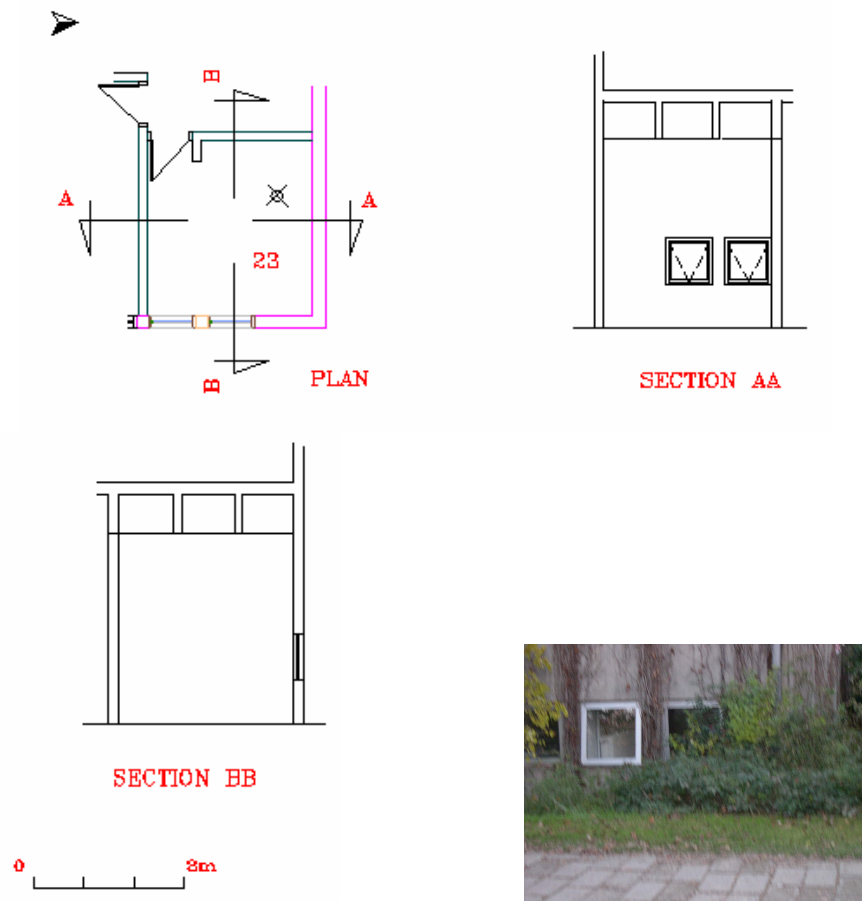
Floor plan, section AA, section BB and exterior view of Room 23.
